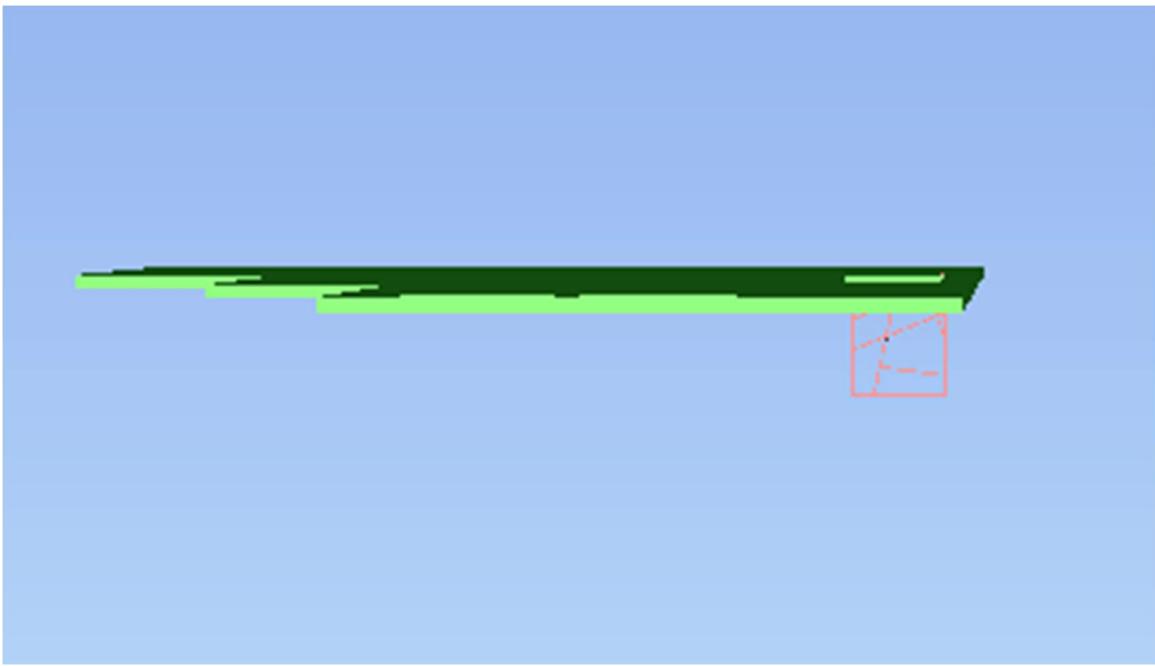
Low Clash of Curtain-wall steel frame (Element ID 30027) vs Concrete slab (Element ID 41112) – Right Side View
